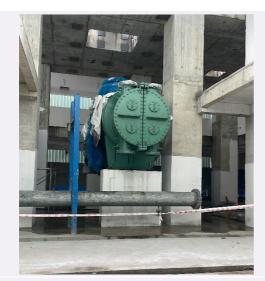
New condenser installed for 8,400 kg/hour WtE facility.
